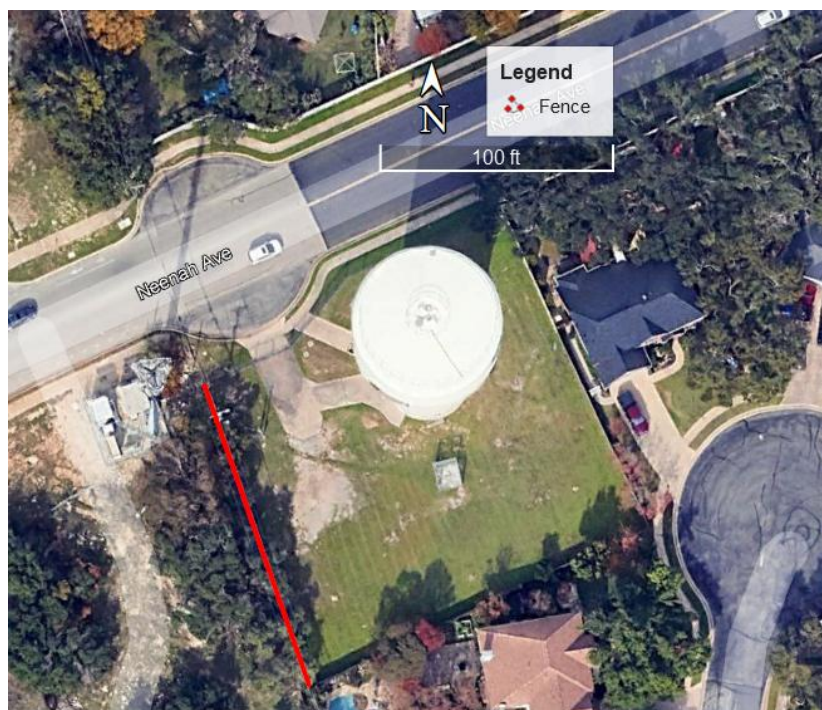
Neenah Elevated Storage Tank Fence Replacement
